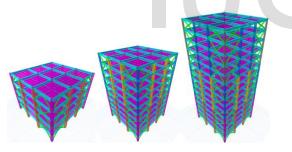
Retrofitting using X-Steel braces for the studied buildings
